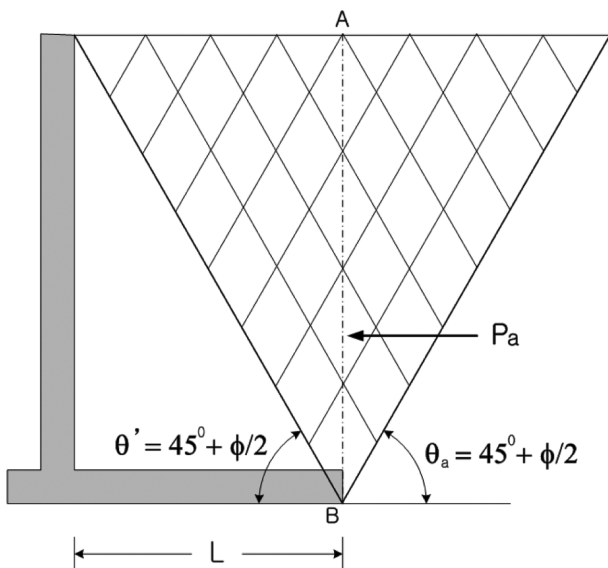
Failure of cohesionless soil behind cantilever retaining wall with enough long heel for active Rankine state.
